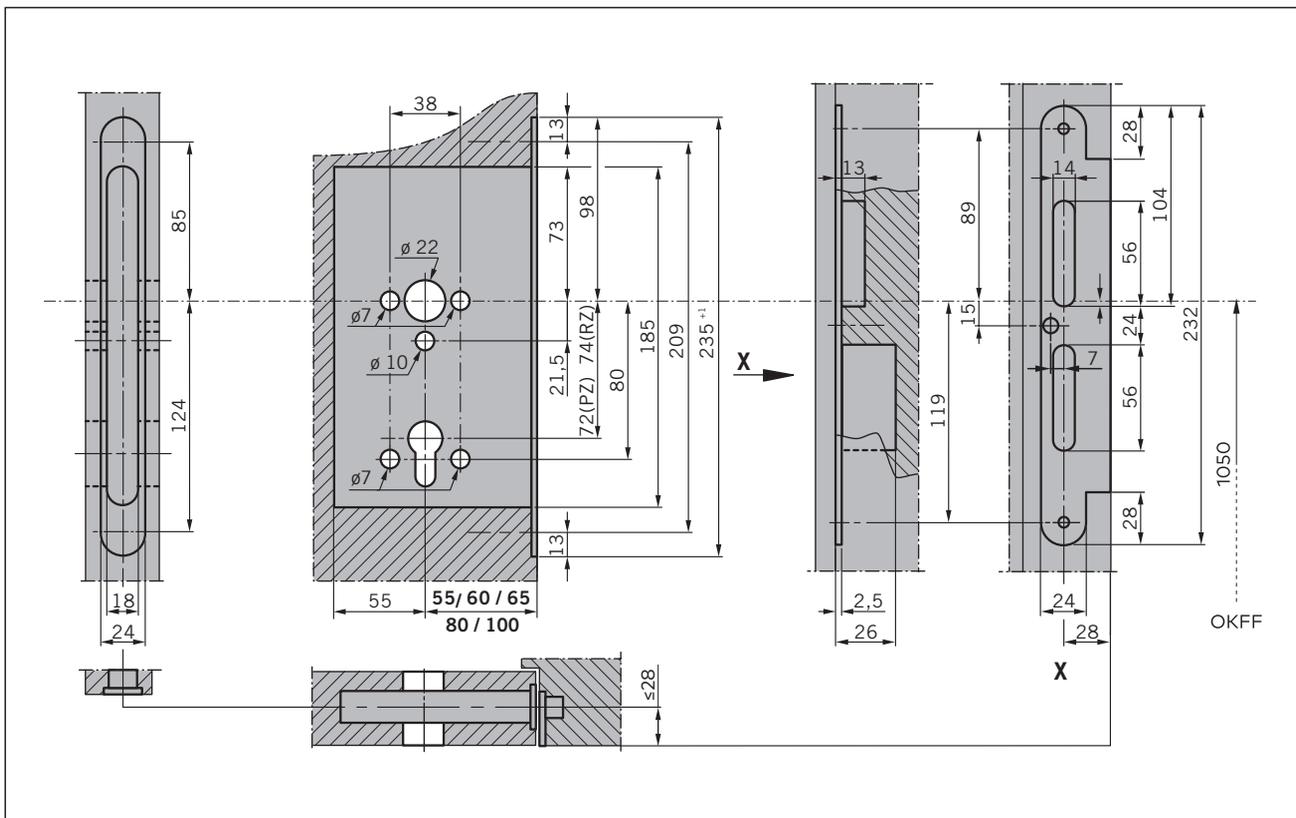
Cut-outs and pre-drilled holes in the door leaf and door frame with a lipped striking plate
